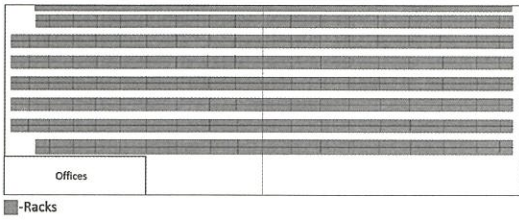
Warehouse Architectural Plan that Shows the Rack's Distribution
